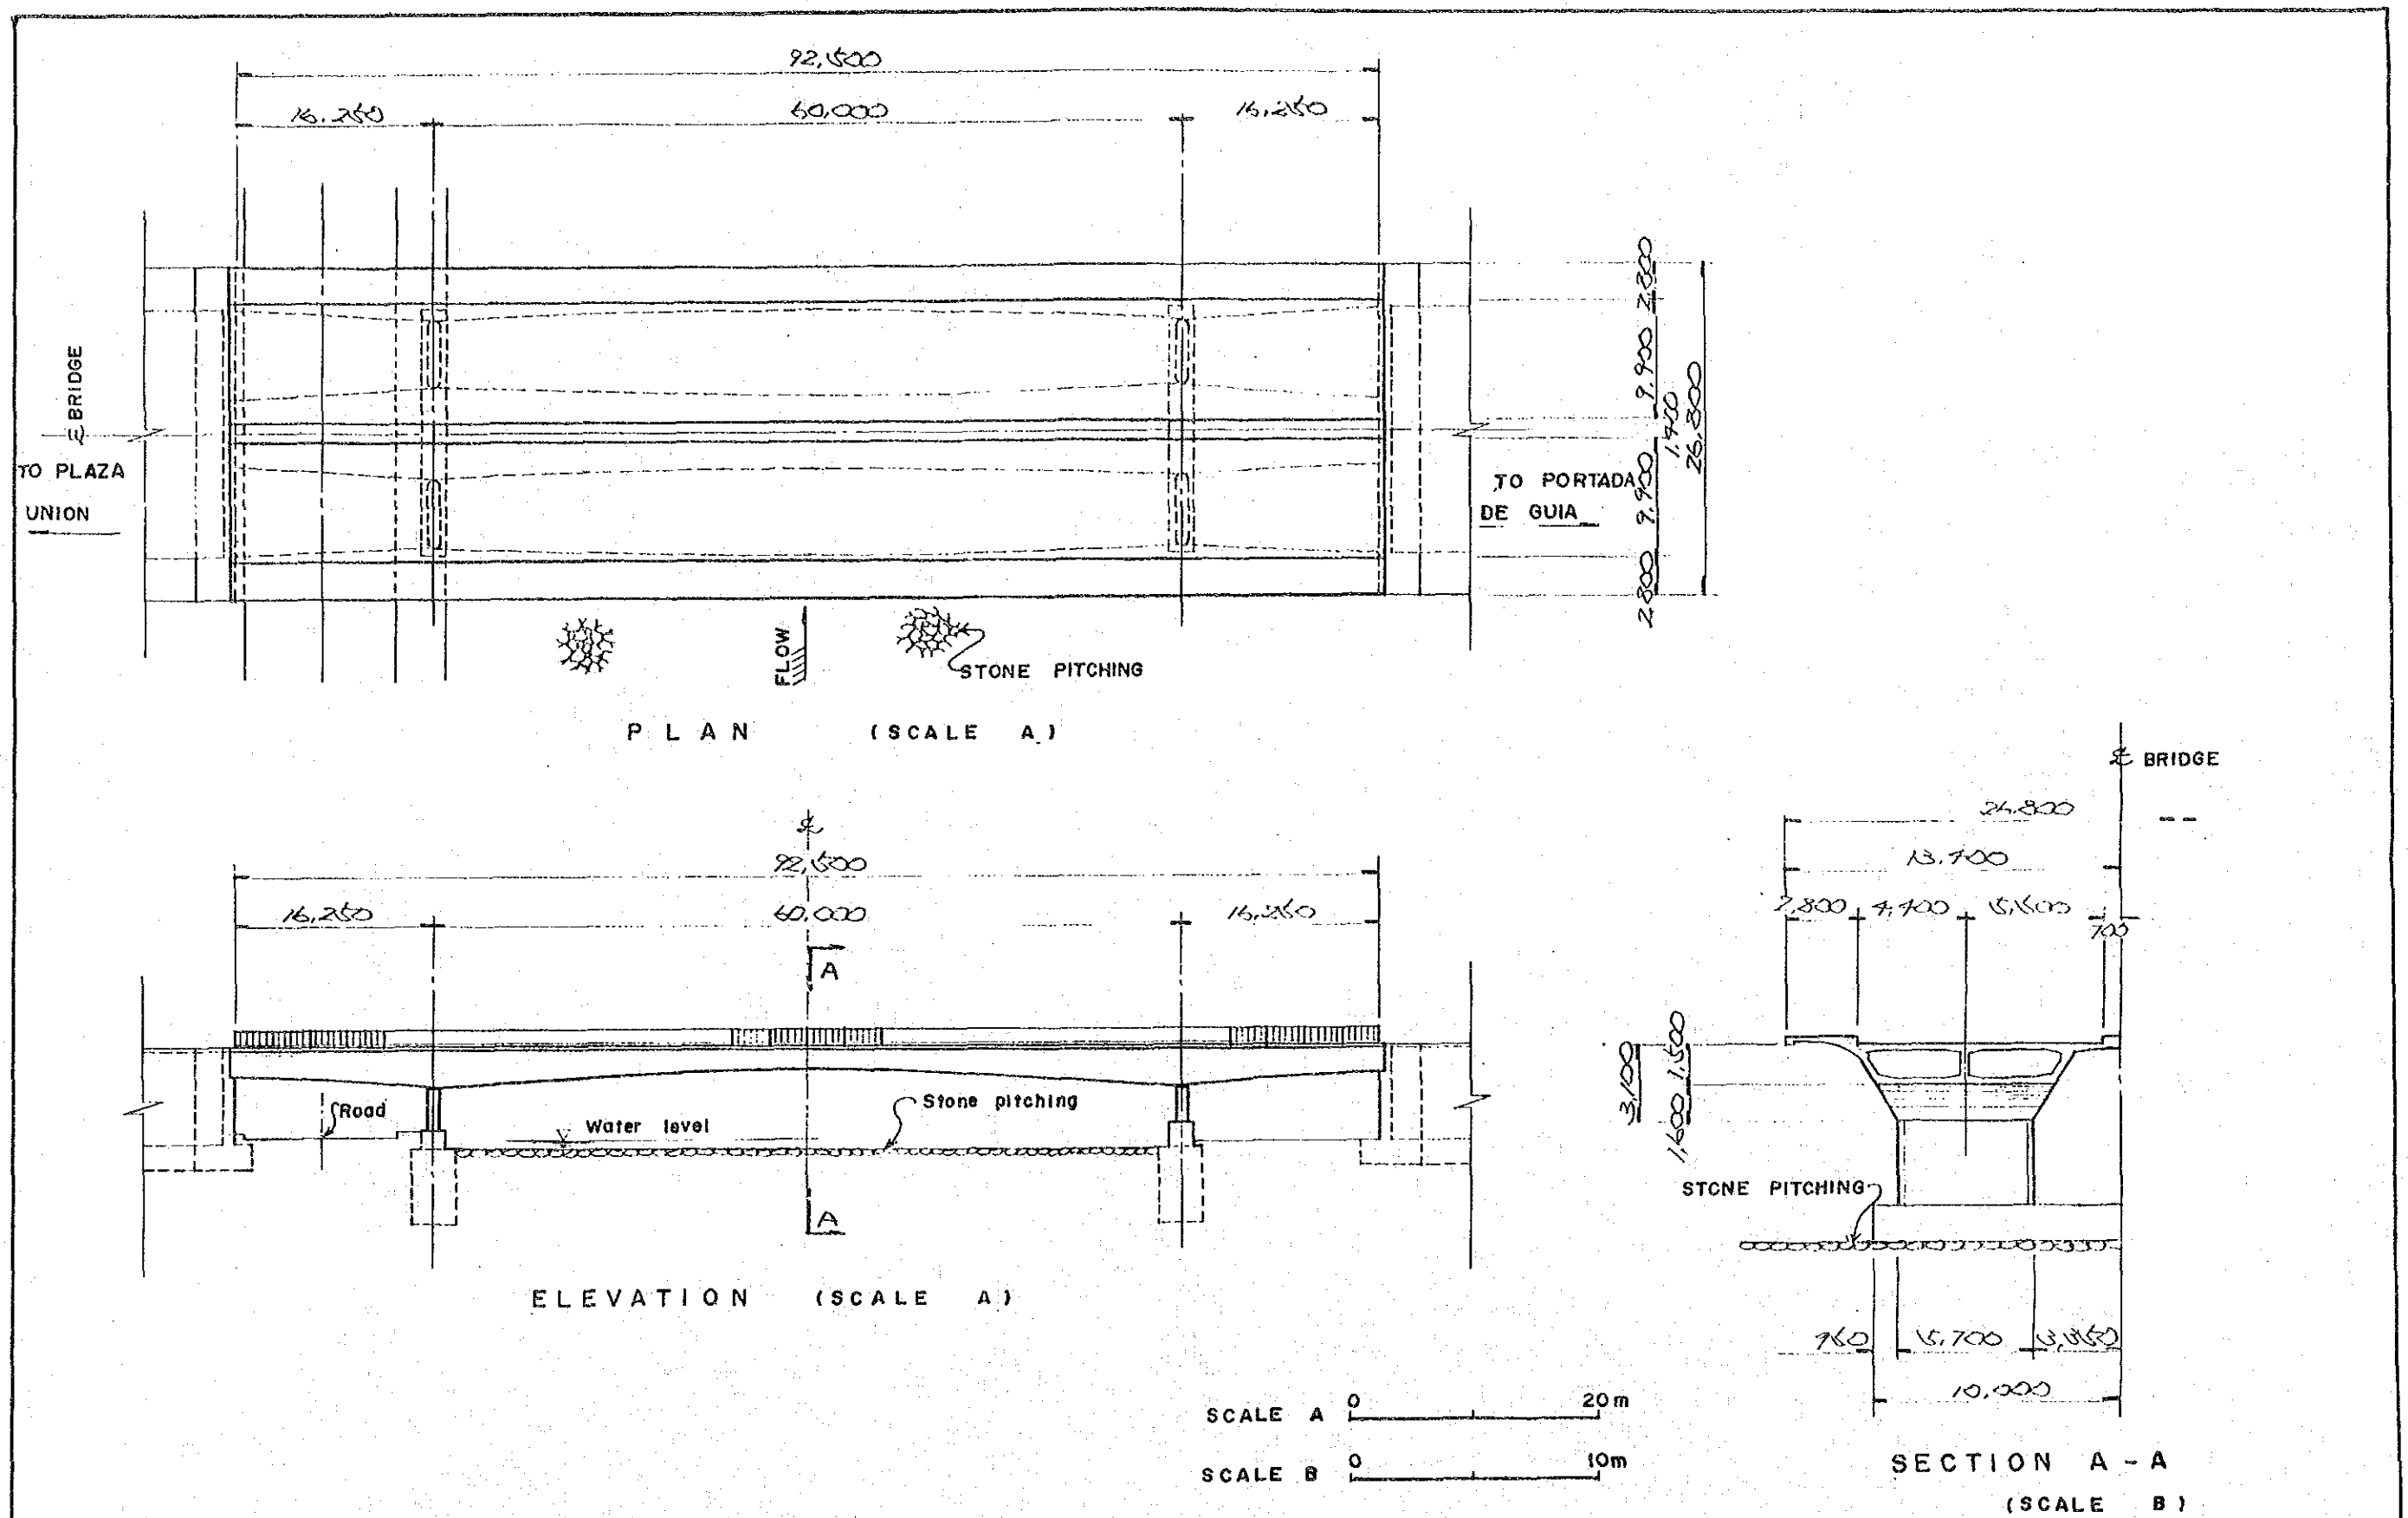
PLAN, ELEVATION AND CROSS SECTION ROADWAY BRIDGE (Ejercito Bridge)
